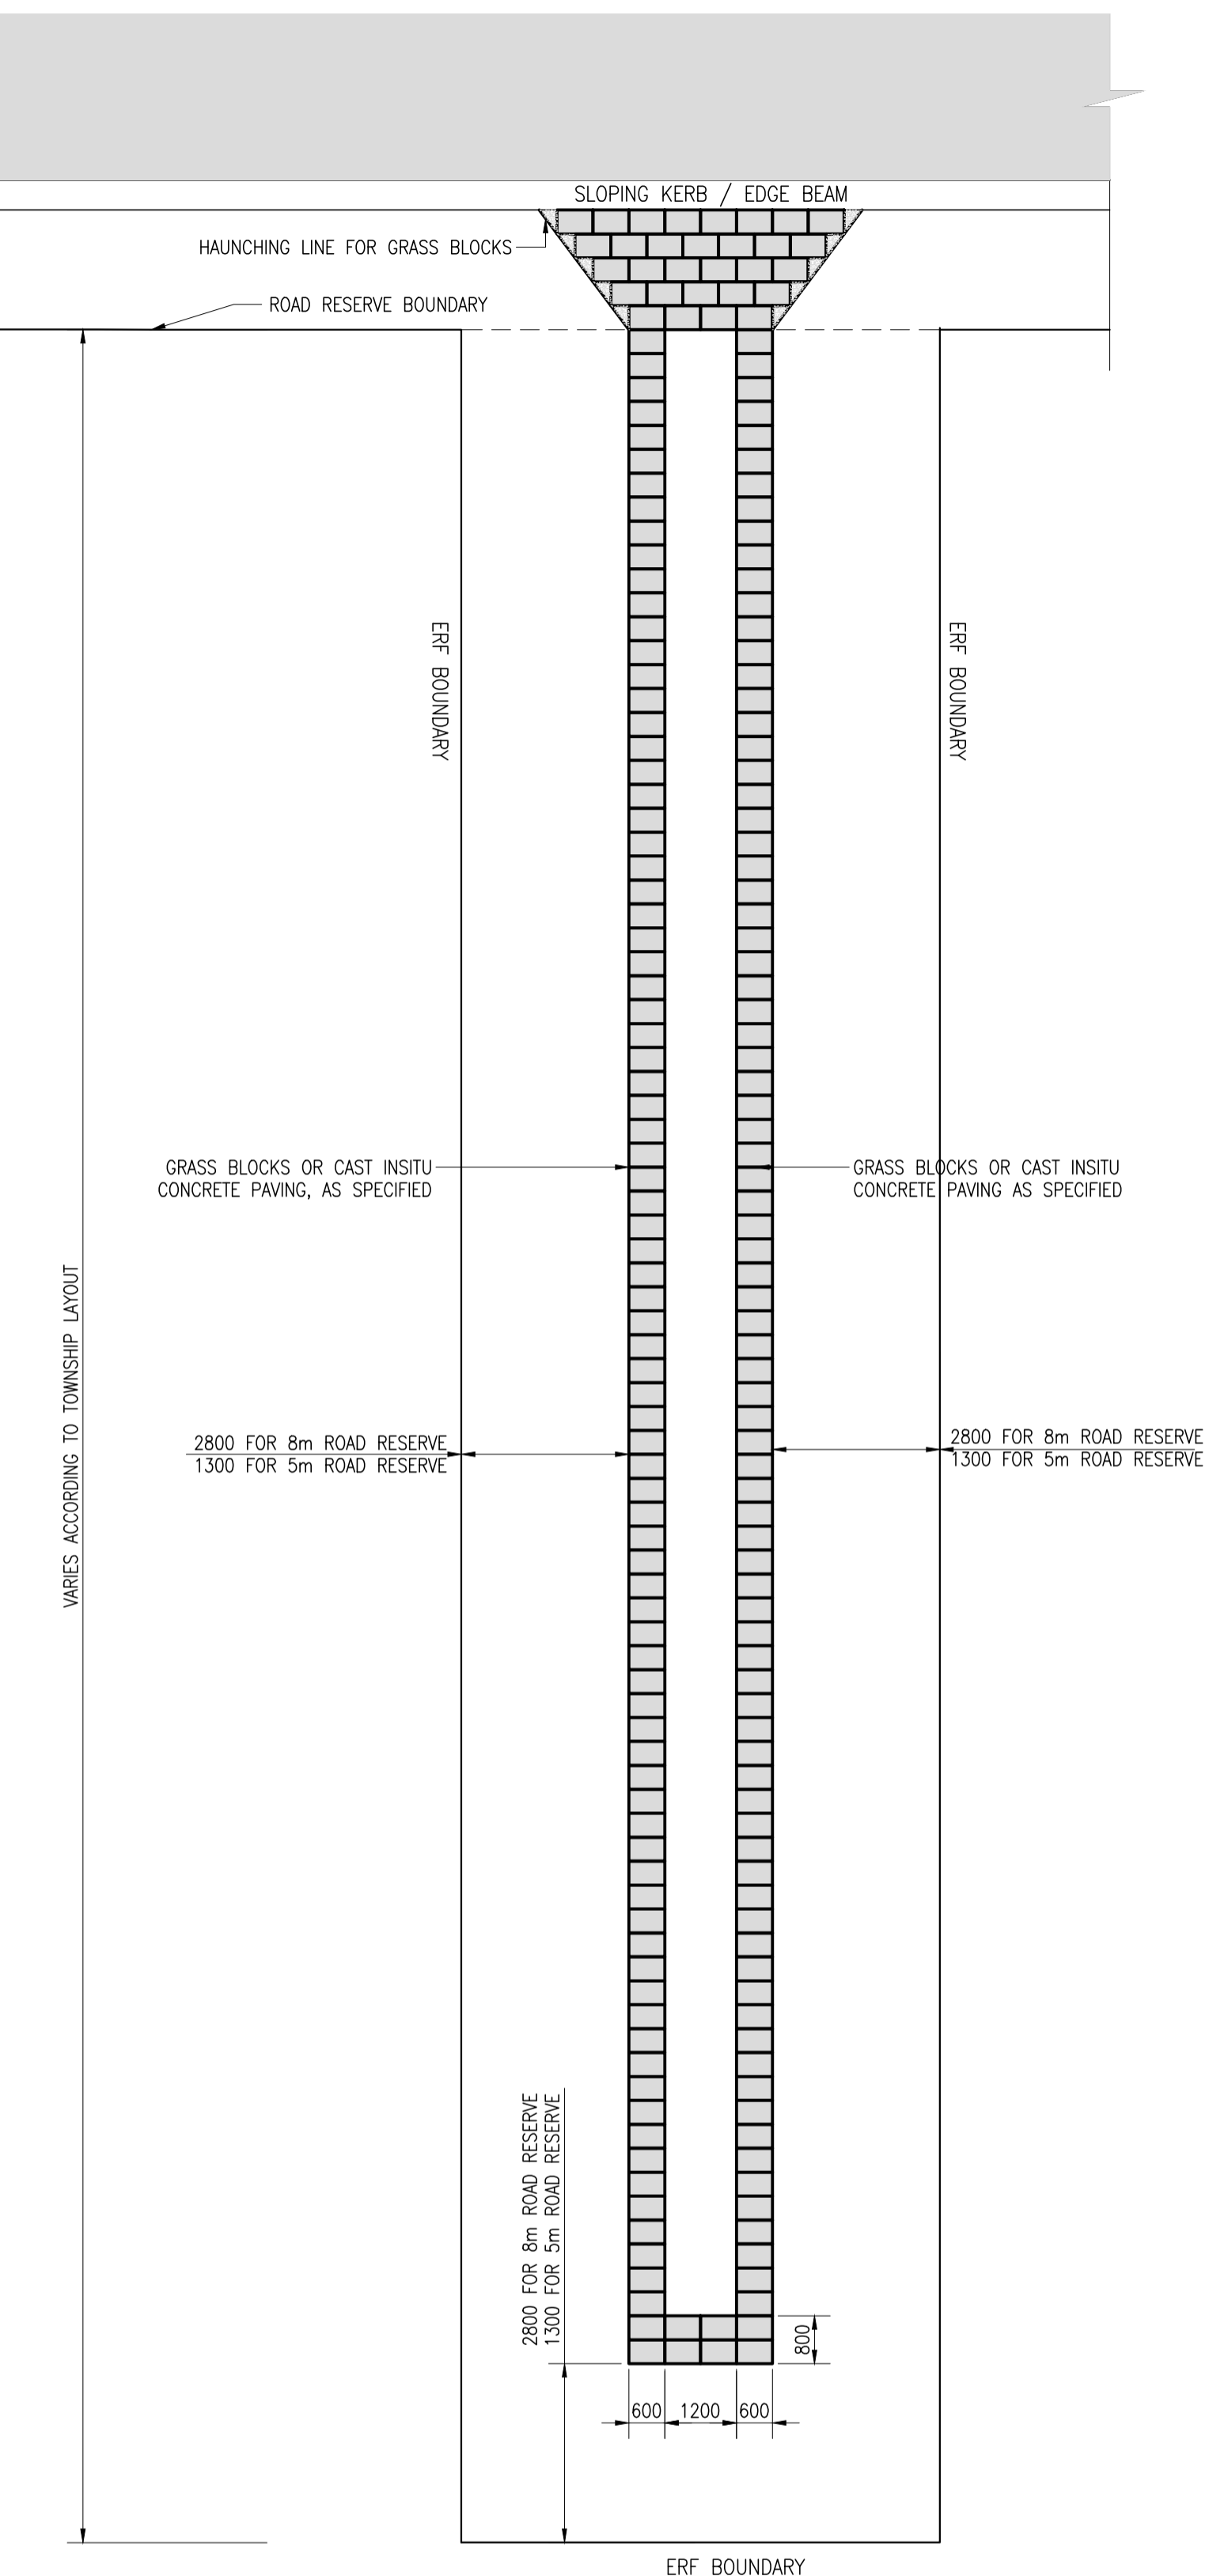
DETAIL OF ACCESS STRIP ENTRANCE (SEE NOTE 2)
